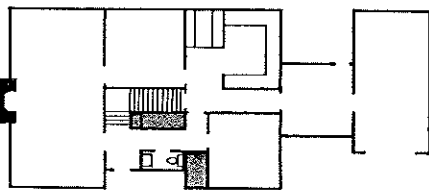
First-floor plan of a two-story residence with basement. 30'-0" x 72'-0".
